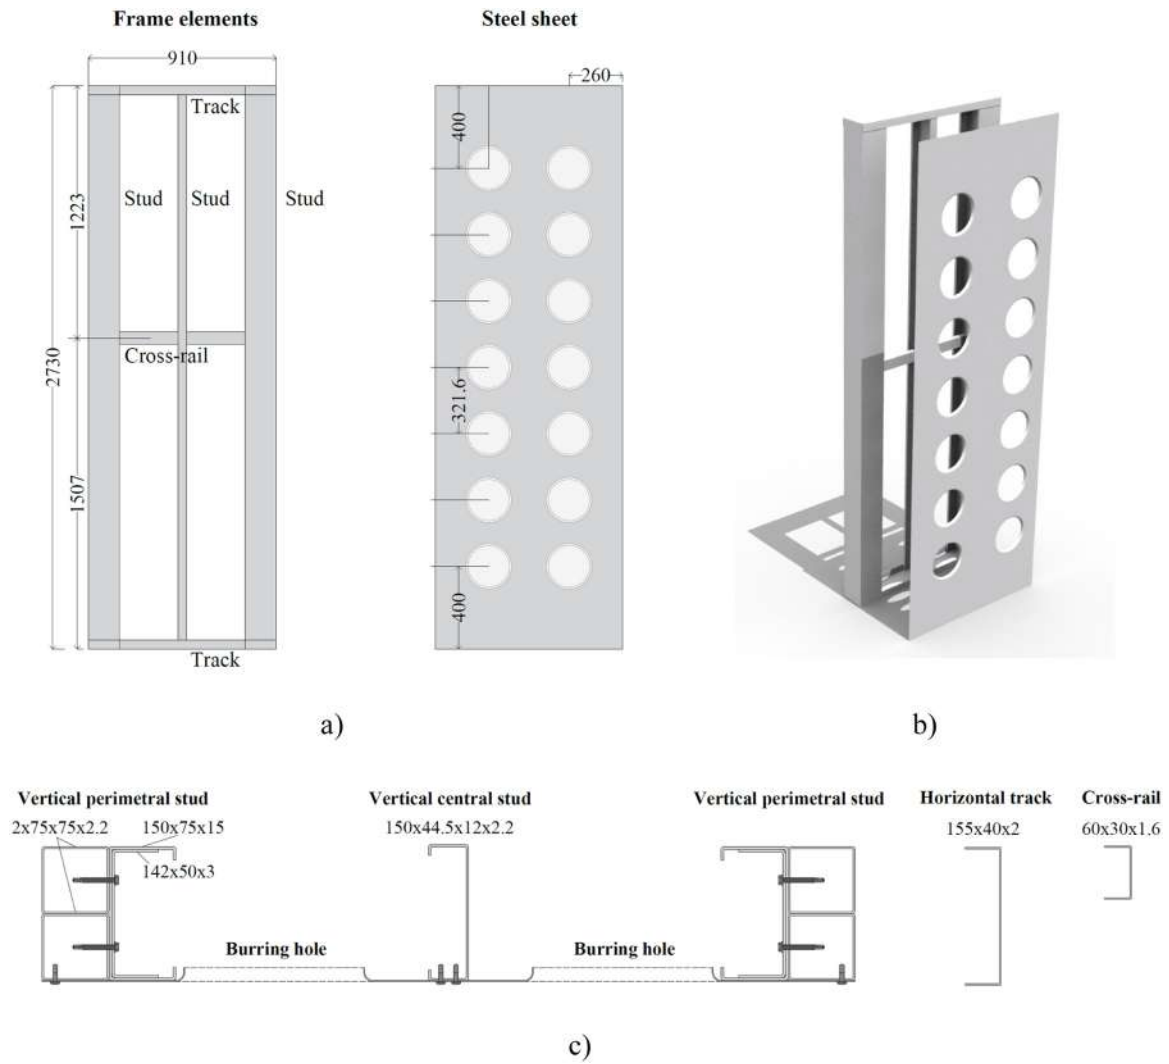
a) Geometrical details of the frame elements and the steel sheet with burring holes (unit: mm), b) three-dimensional representation of the shear wall system and c) cross-sectional view of the panel with details of cold-formed profiles.
